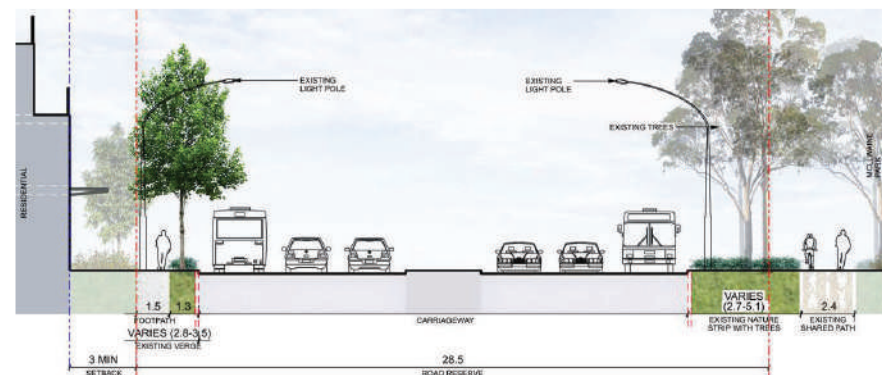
Concord Road South (Mcllwaine Park) - Typical Section
